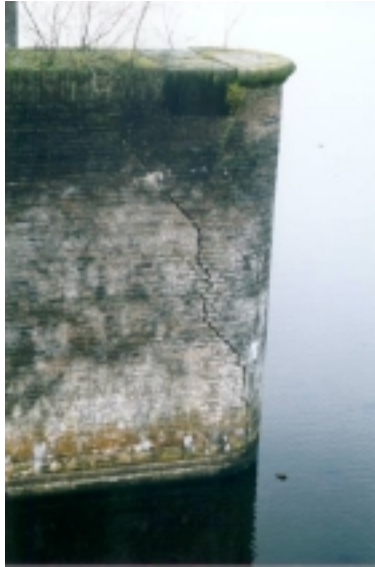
Example of cracking in one of the brick masonry piles.
